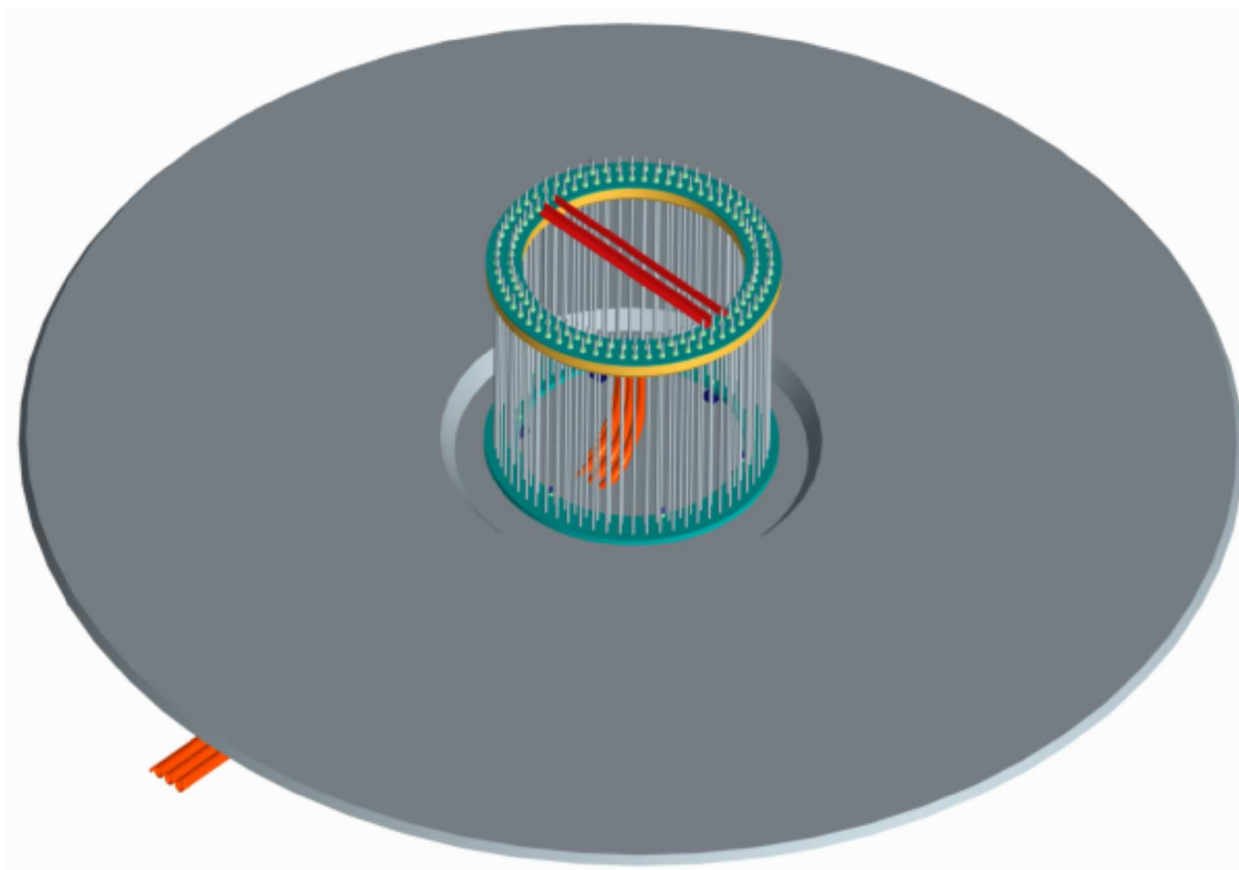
Anchor cage at centre of foundation. Reinforcement not shown
